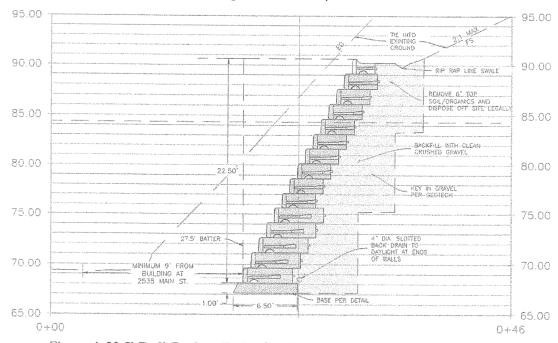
22.5' Redi-Rock wall with 9' offset and matching top of failure slope.
